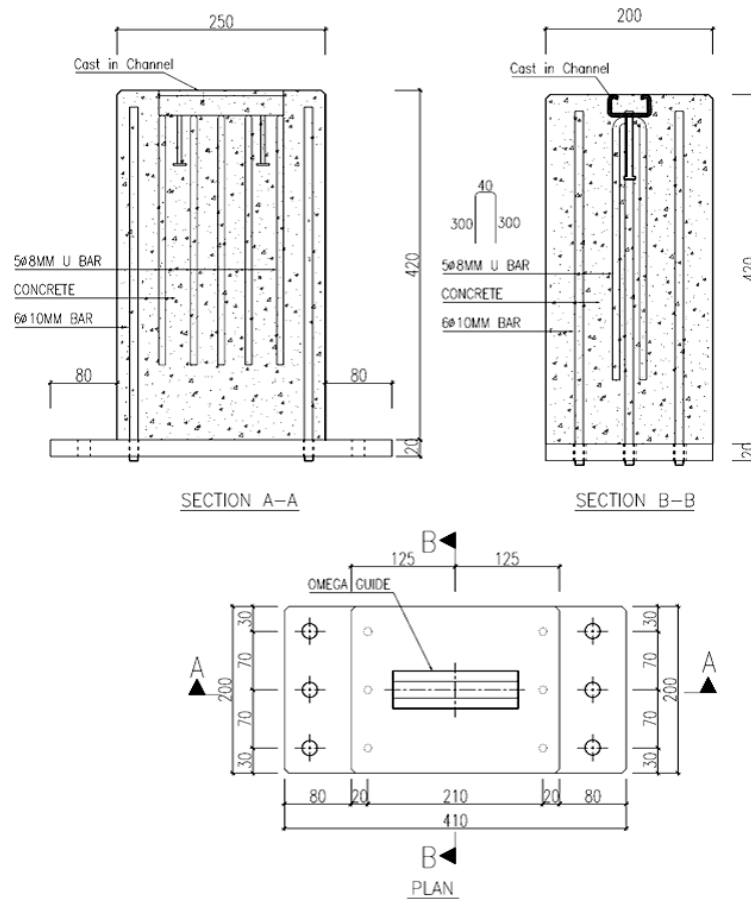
Drawing of the first sample showing the welded reinforcement bar to cast in channel.
